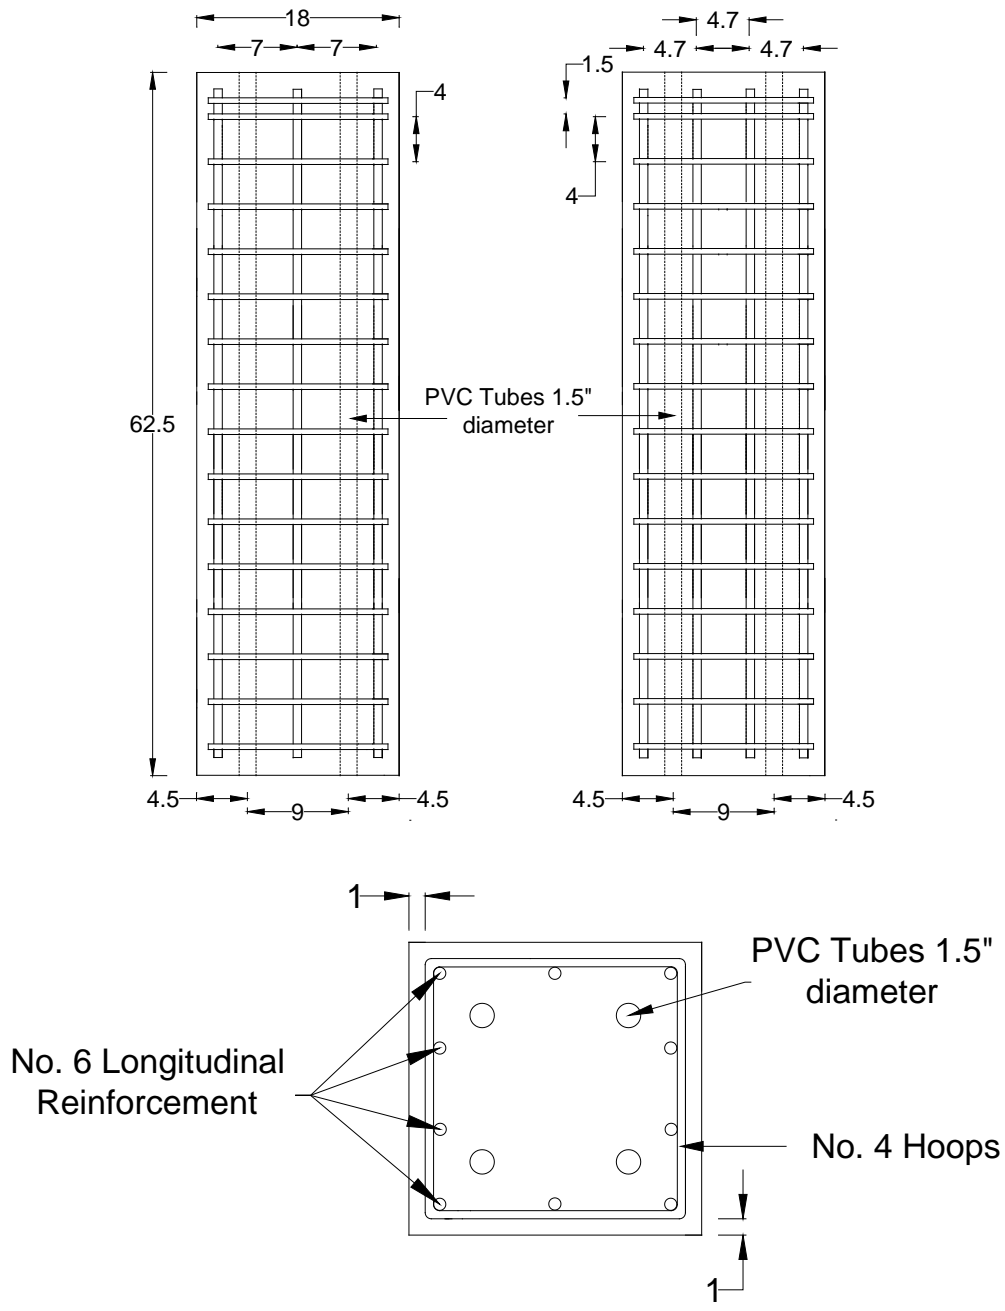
Small block reinforcement detailing for SW-1(all dimensions in inches)
